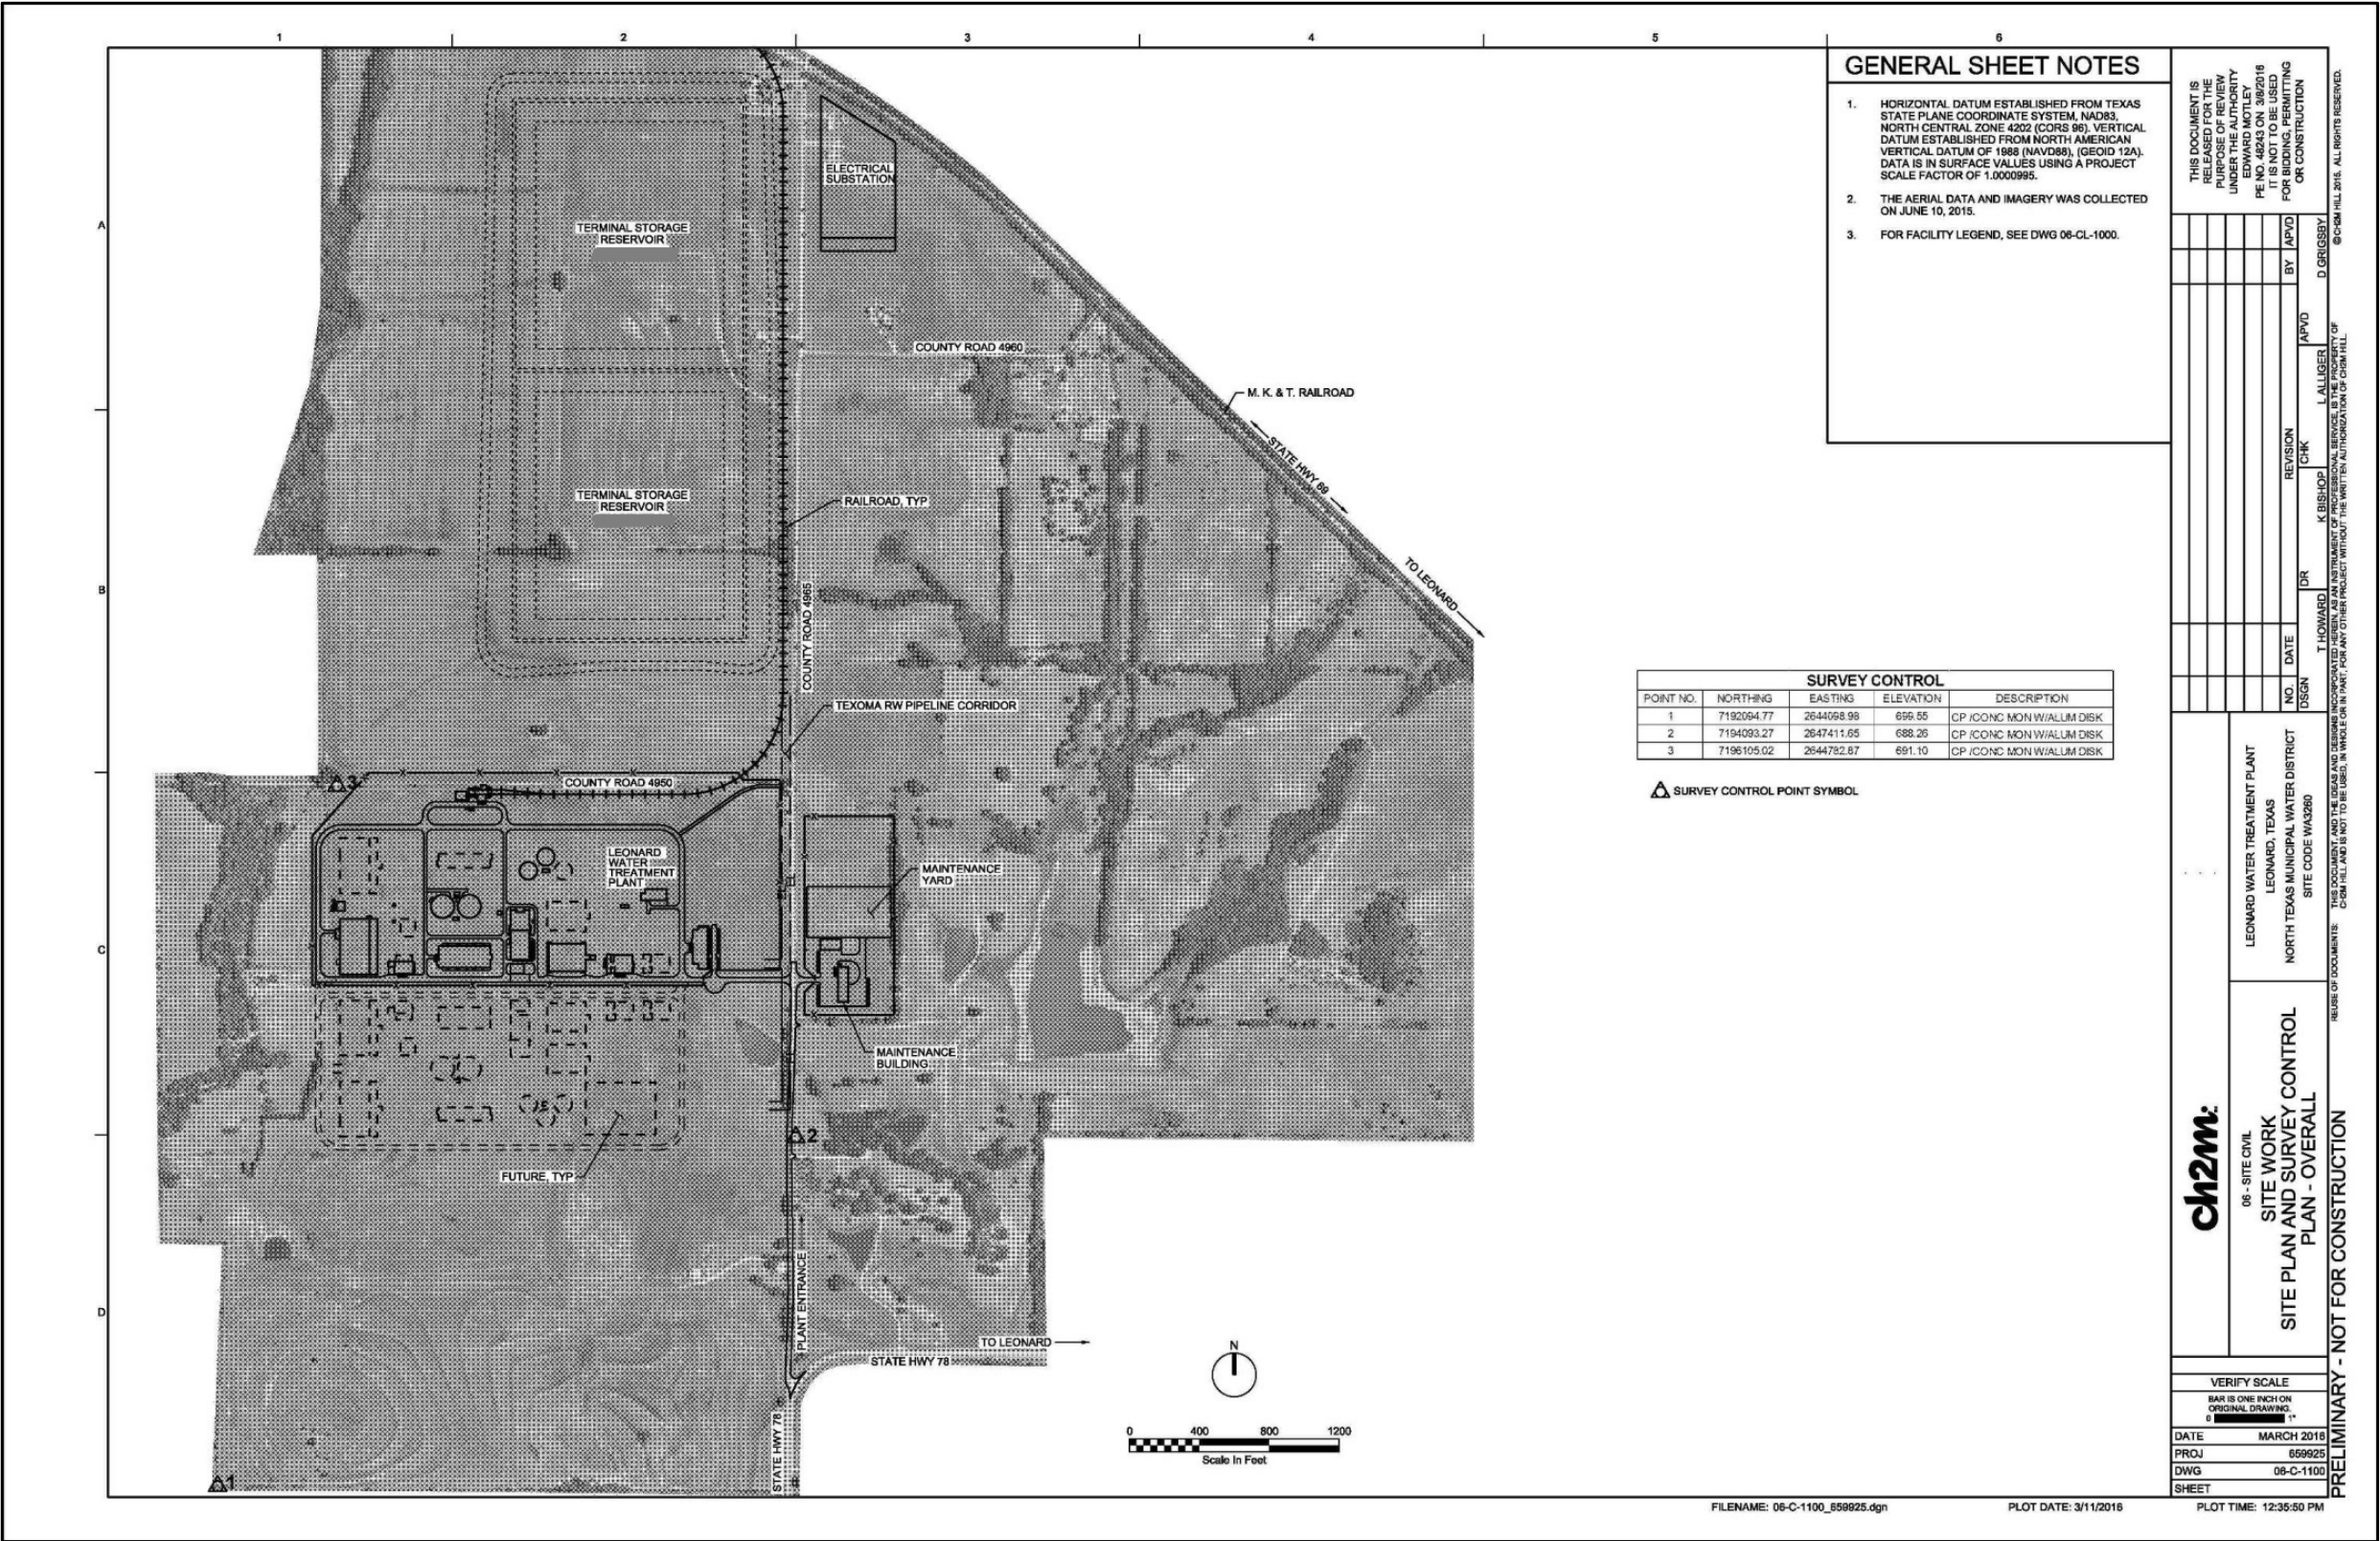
Site Plan Showing Proposed North WTP and TSR
